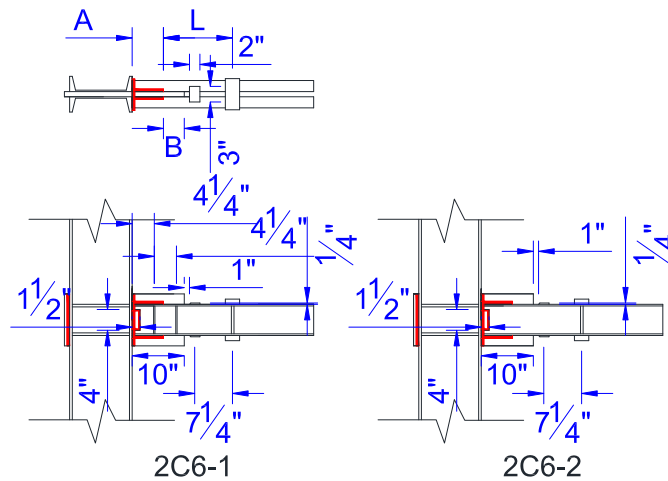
Dimensional Details of Specimens 2C6-1 and 2C6-2
